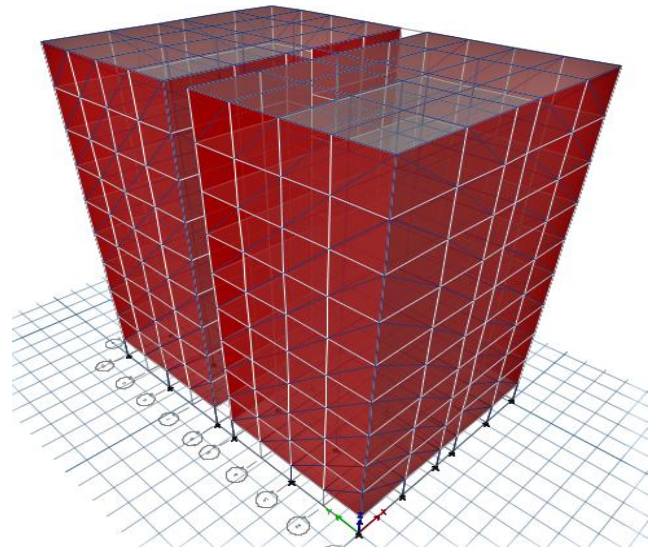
3D view of model2(G+9) multistoried bare frame building with bracing in IS code
